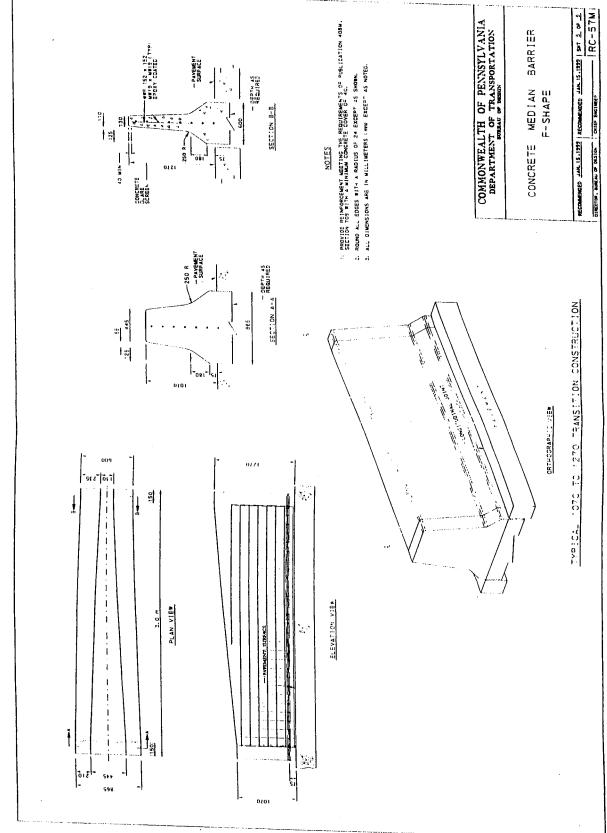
Detailed drawing of concrete median barrier F-shape (5 of 5).
